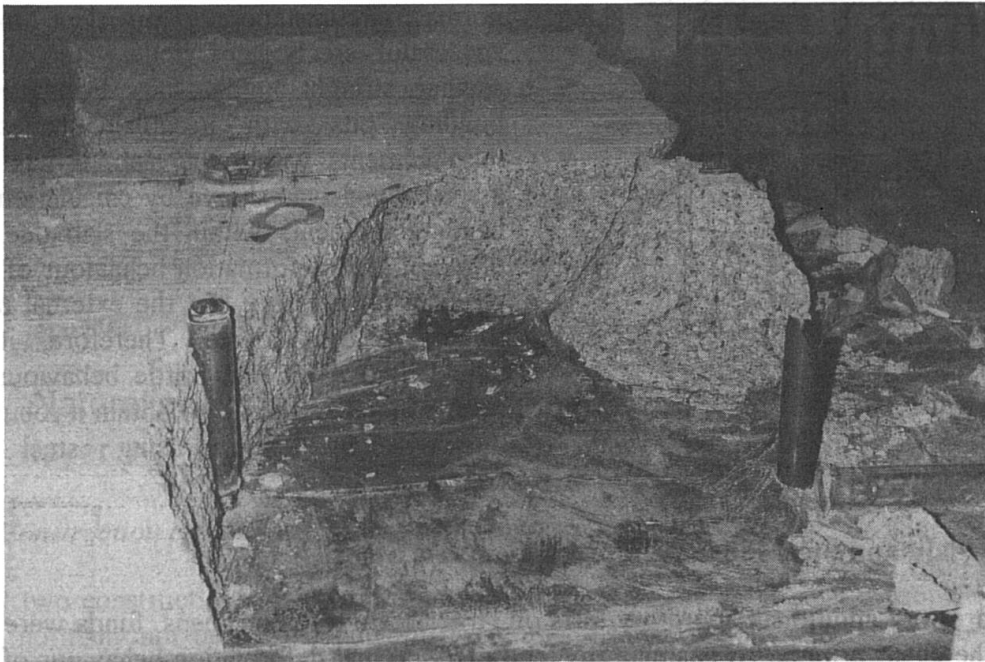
Remains of the plain concrete slabs after failure
